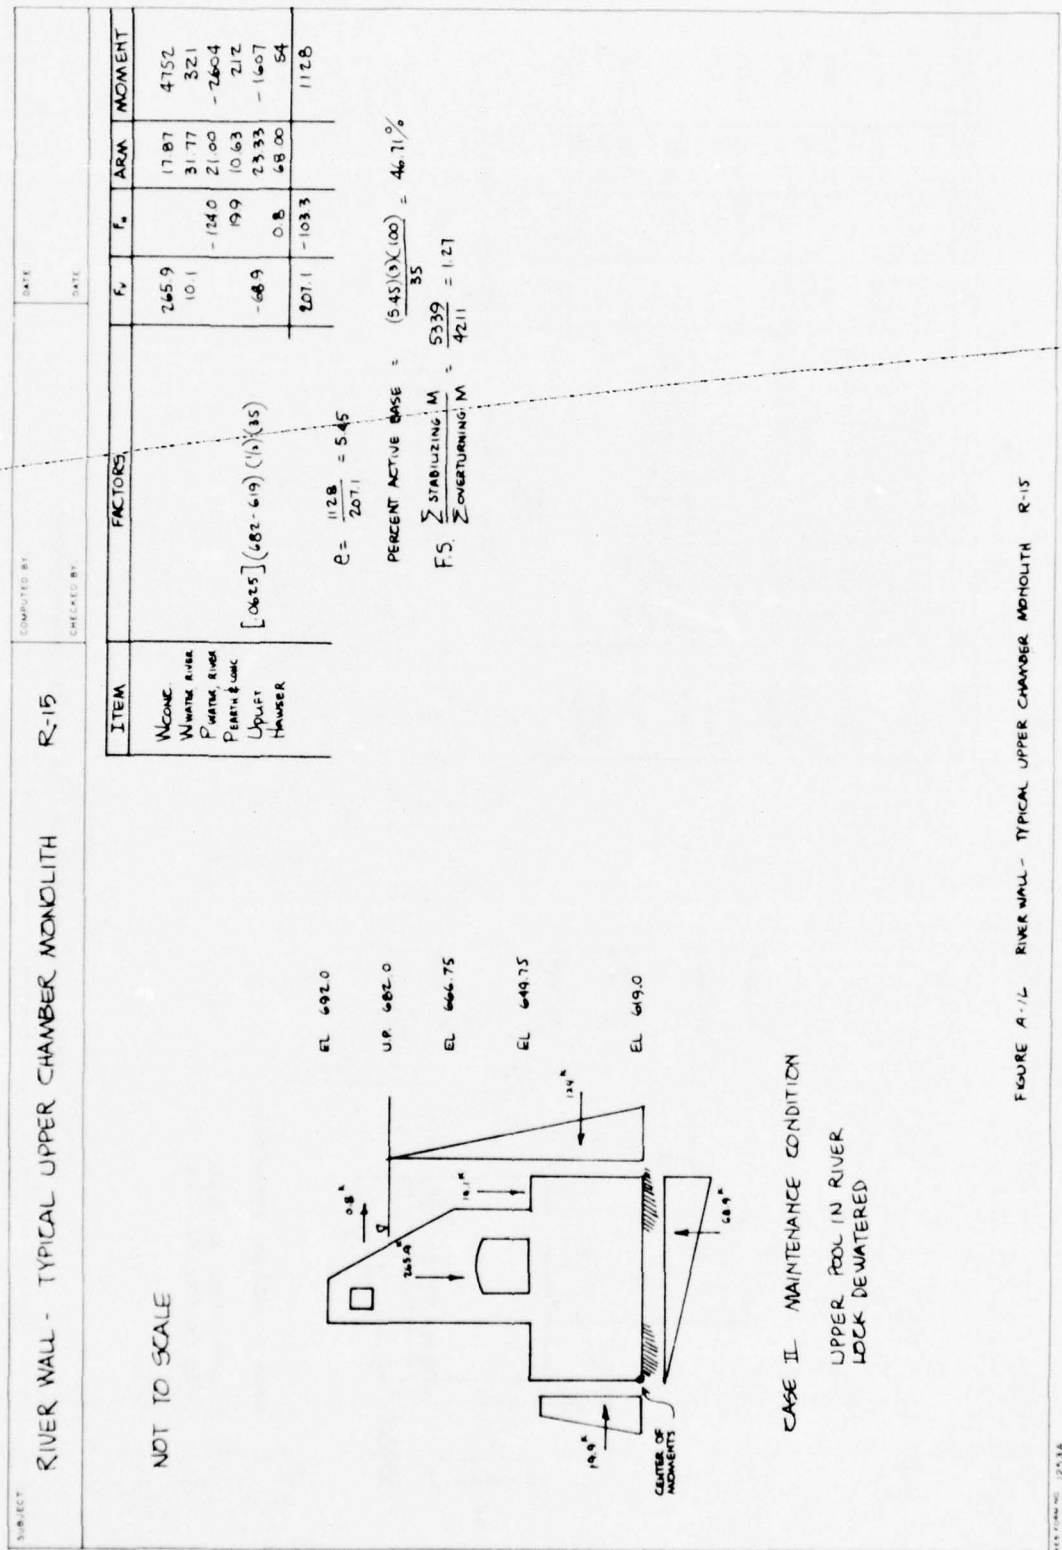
RIVER WALL - TYPICAL UPPER CHAMBER MONOLITH R-15
